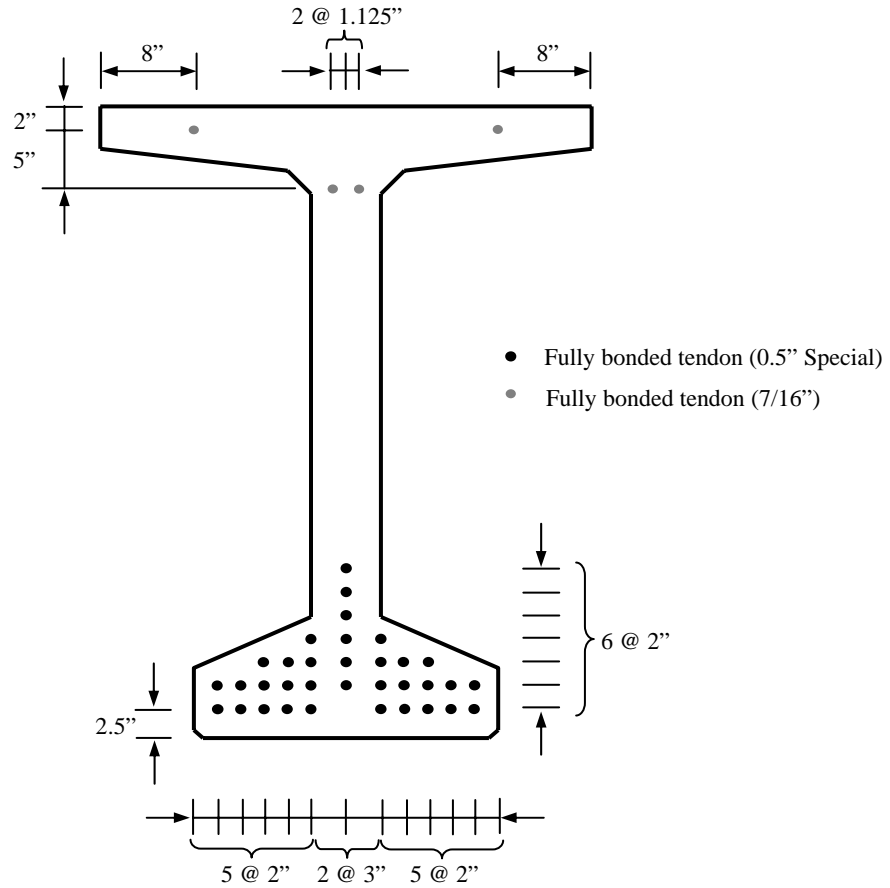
Girder Midspan Strand Pattern (Swenson 2003)
